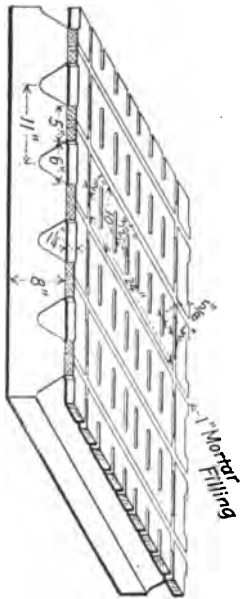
Constructing trickling filter floor, Fitchburg, Mass.
